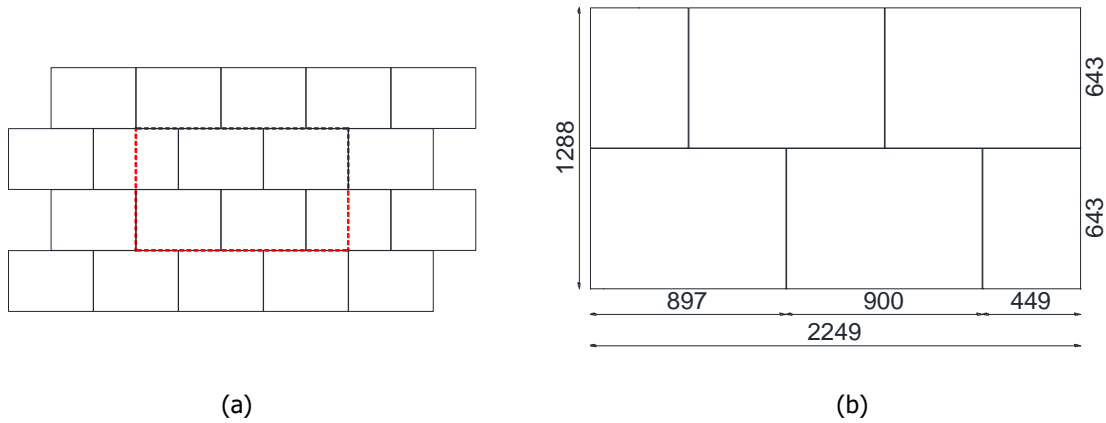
Horizontal out-of-plane bending test (OOP2): (a) tested portion; (b) dimensions of the specimen.
